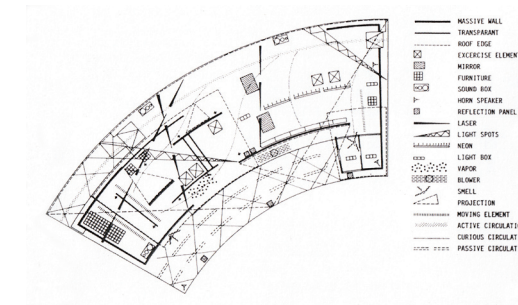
Plan, OMA reconstruction of the pavilion at the Milan Triennale, 1985.
